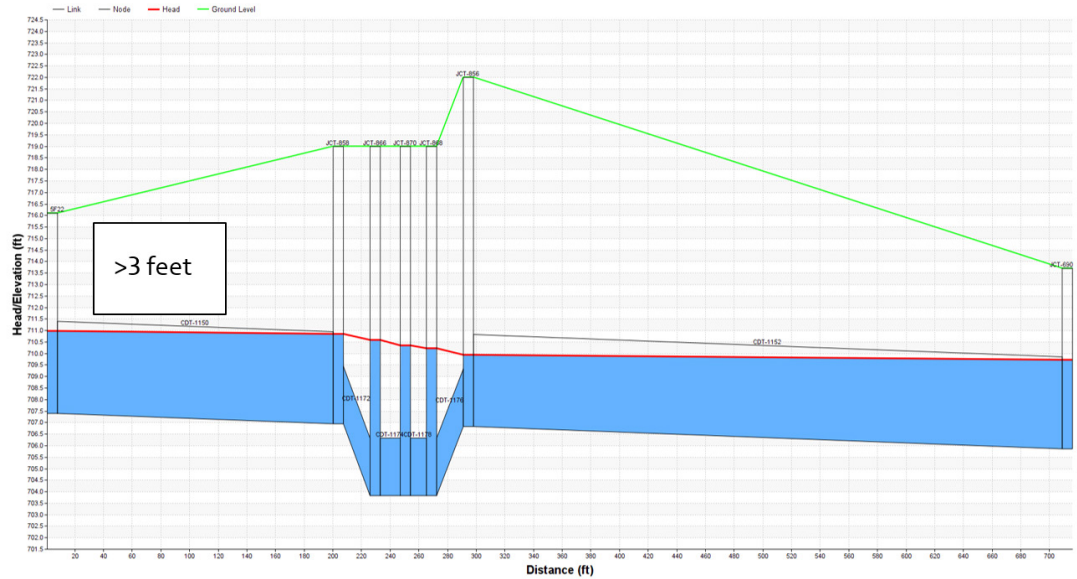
A/A Trunk Sewer - 30-Inch Inverted Siphon HGL Under Existing PWWF Conditions
